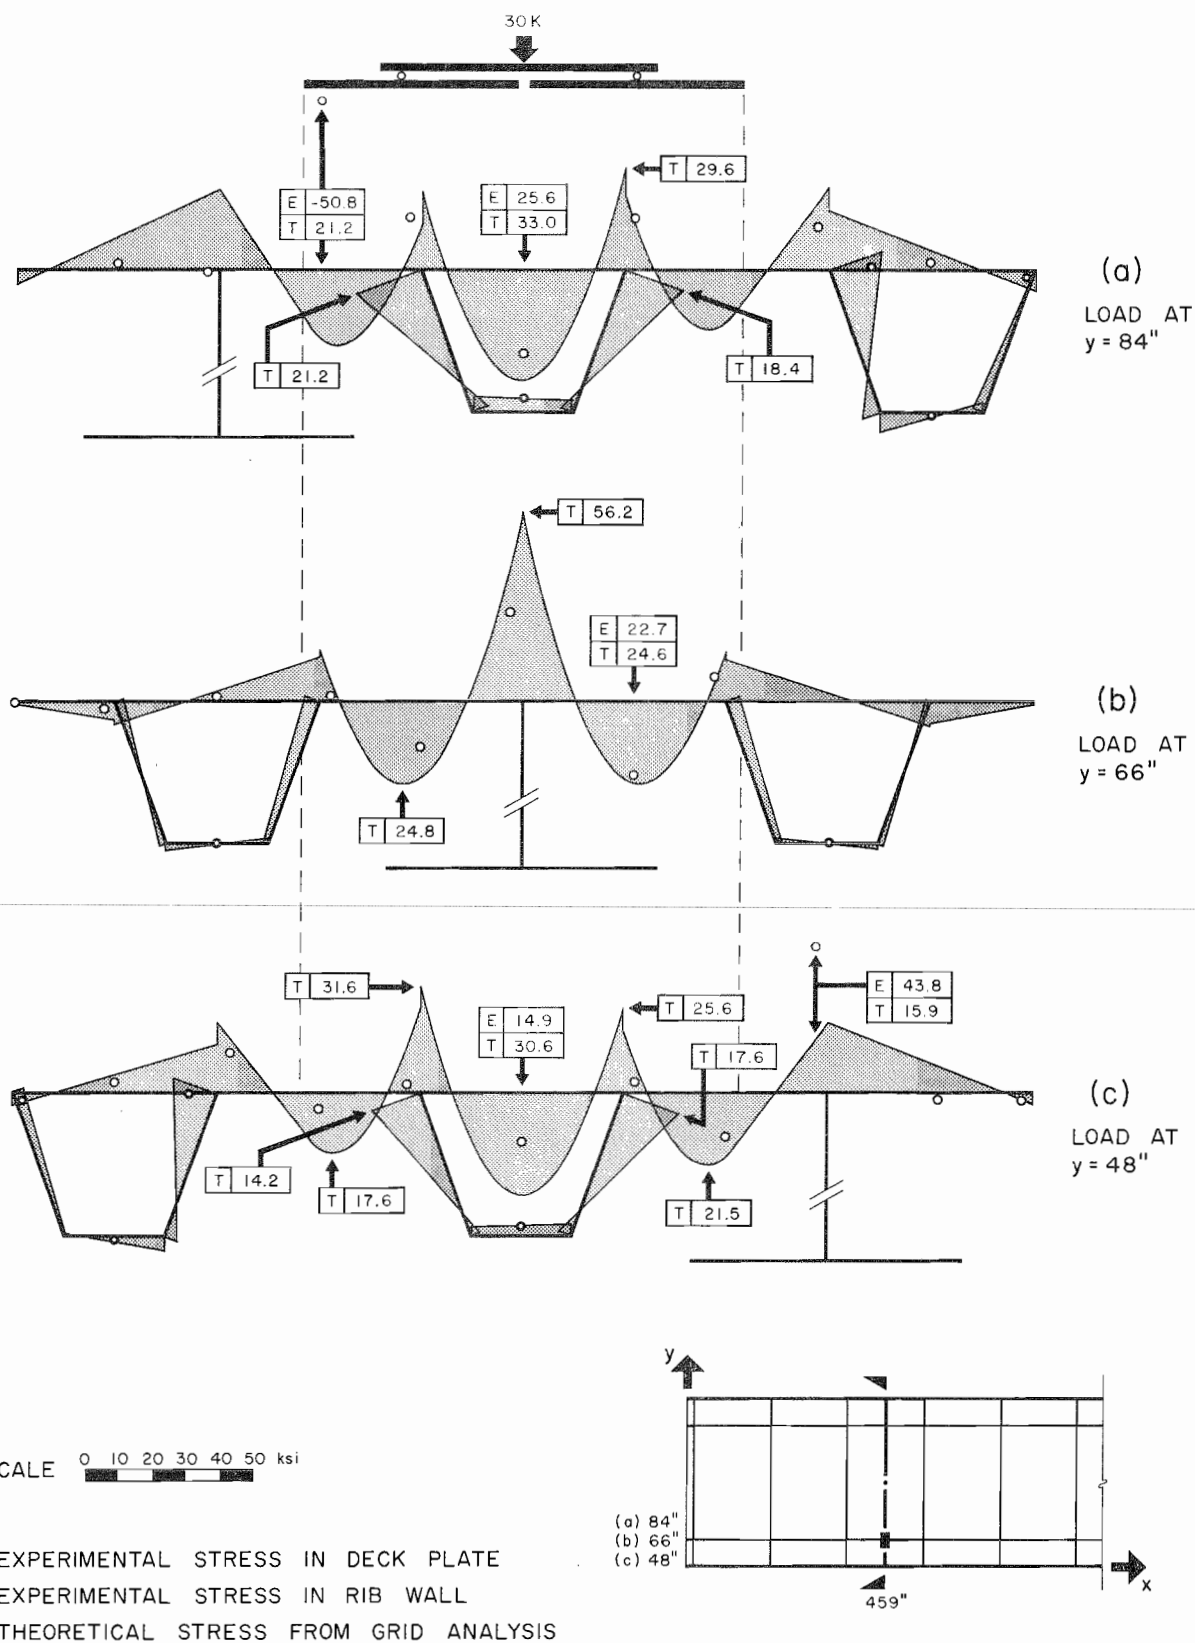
TRANSVERSE BENDING STRESSES IN DECK PLATE AND RIB WALLS, BRIDGE I.
